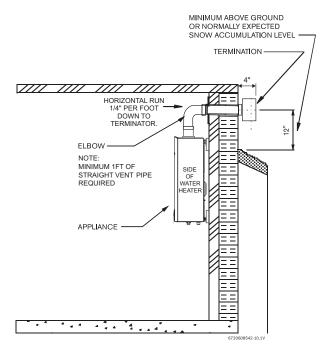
Horizontal venting installation (combustion air piping not shown)
